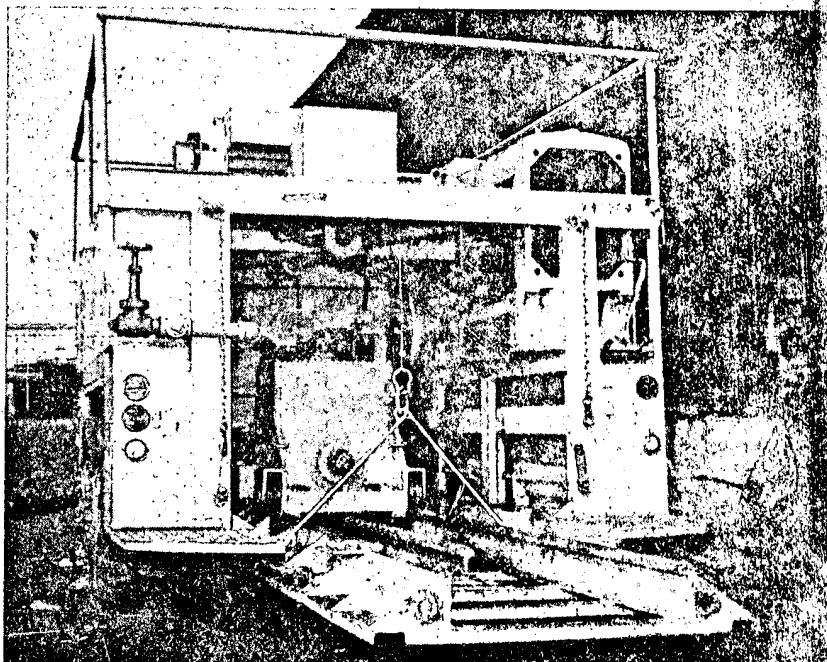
Rear view of searchlight trailer-mounted horizontal earth boring unit, shows track rail, trailer hooks, ready to be lowered, as it would be when in use, by unit's electric driven elevator.
